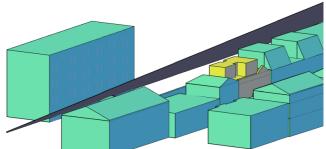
25 degree line emanating from ground floor windows of 248-250 Camden Road
